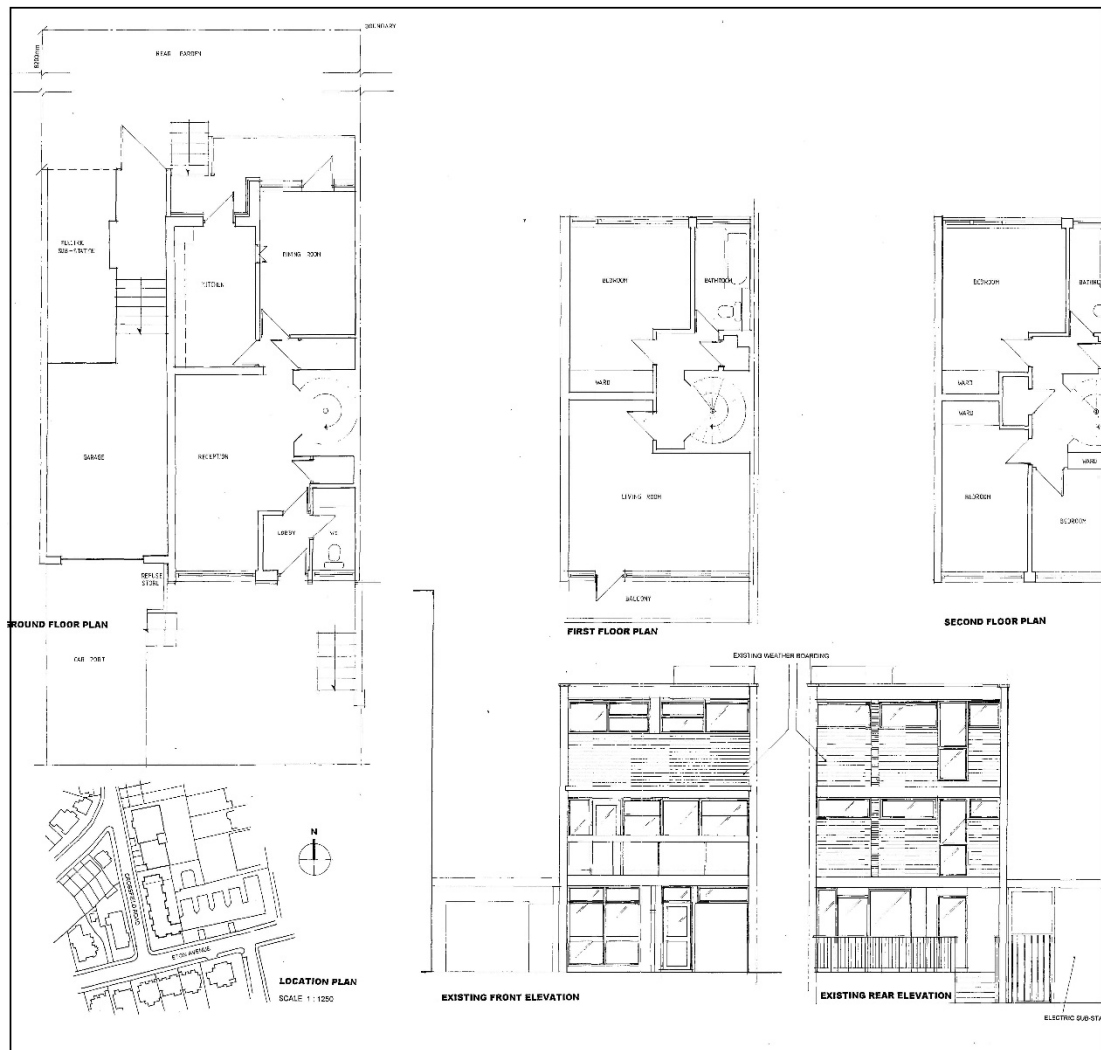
Existing arrangement of 24 Crossfield Road 1998
